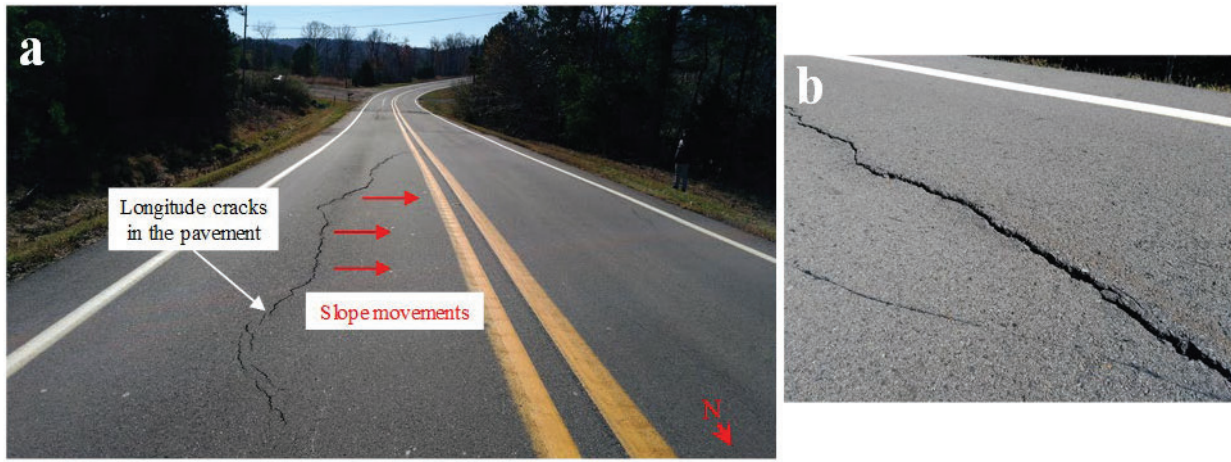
Longitudinal crack in the pavement. a) Slope movement b) longitudinal crack.
